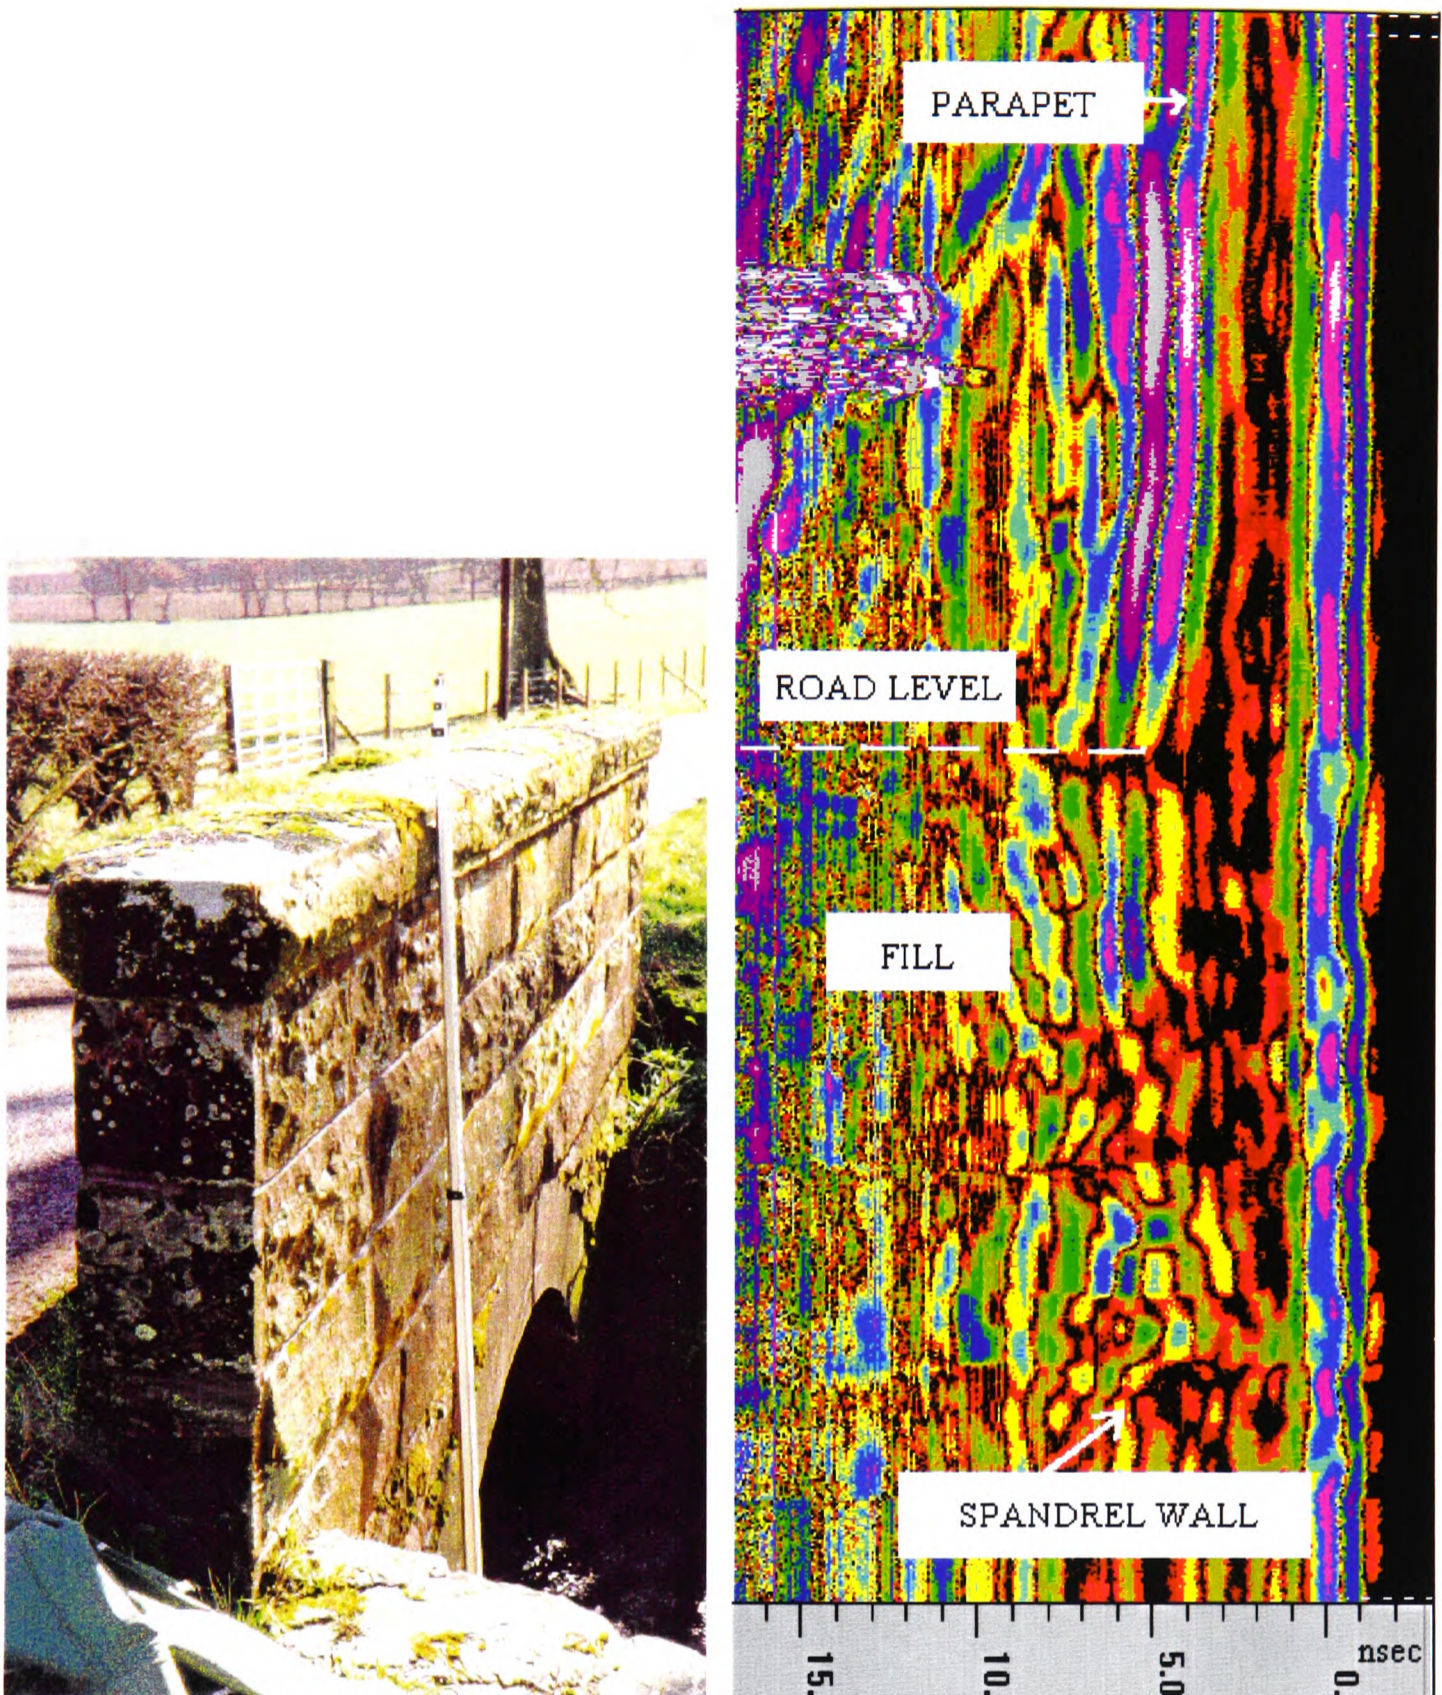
Kilbucho Bridge: side view of stone parapet (left); radar vertical section through parapet and spandrel wall (right).
